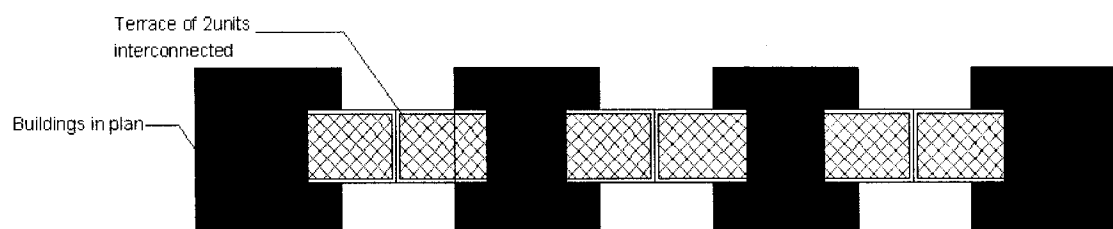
shows plan of buildings that are linked by terraces in a large scale complex.
